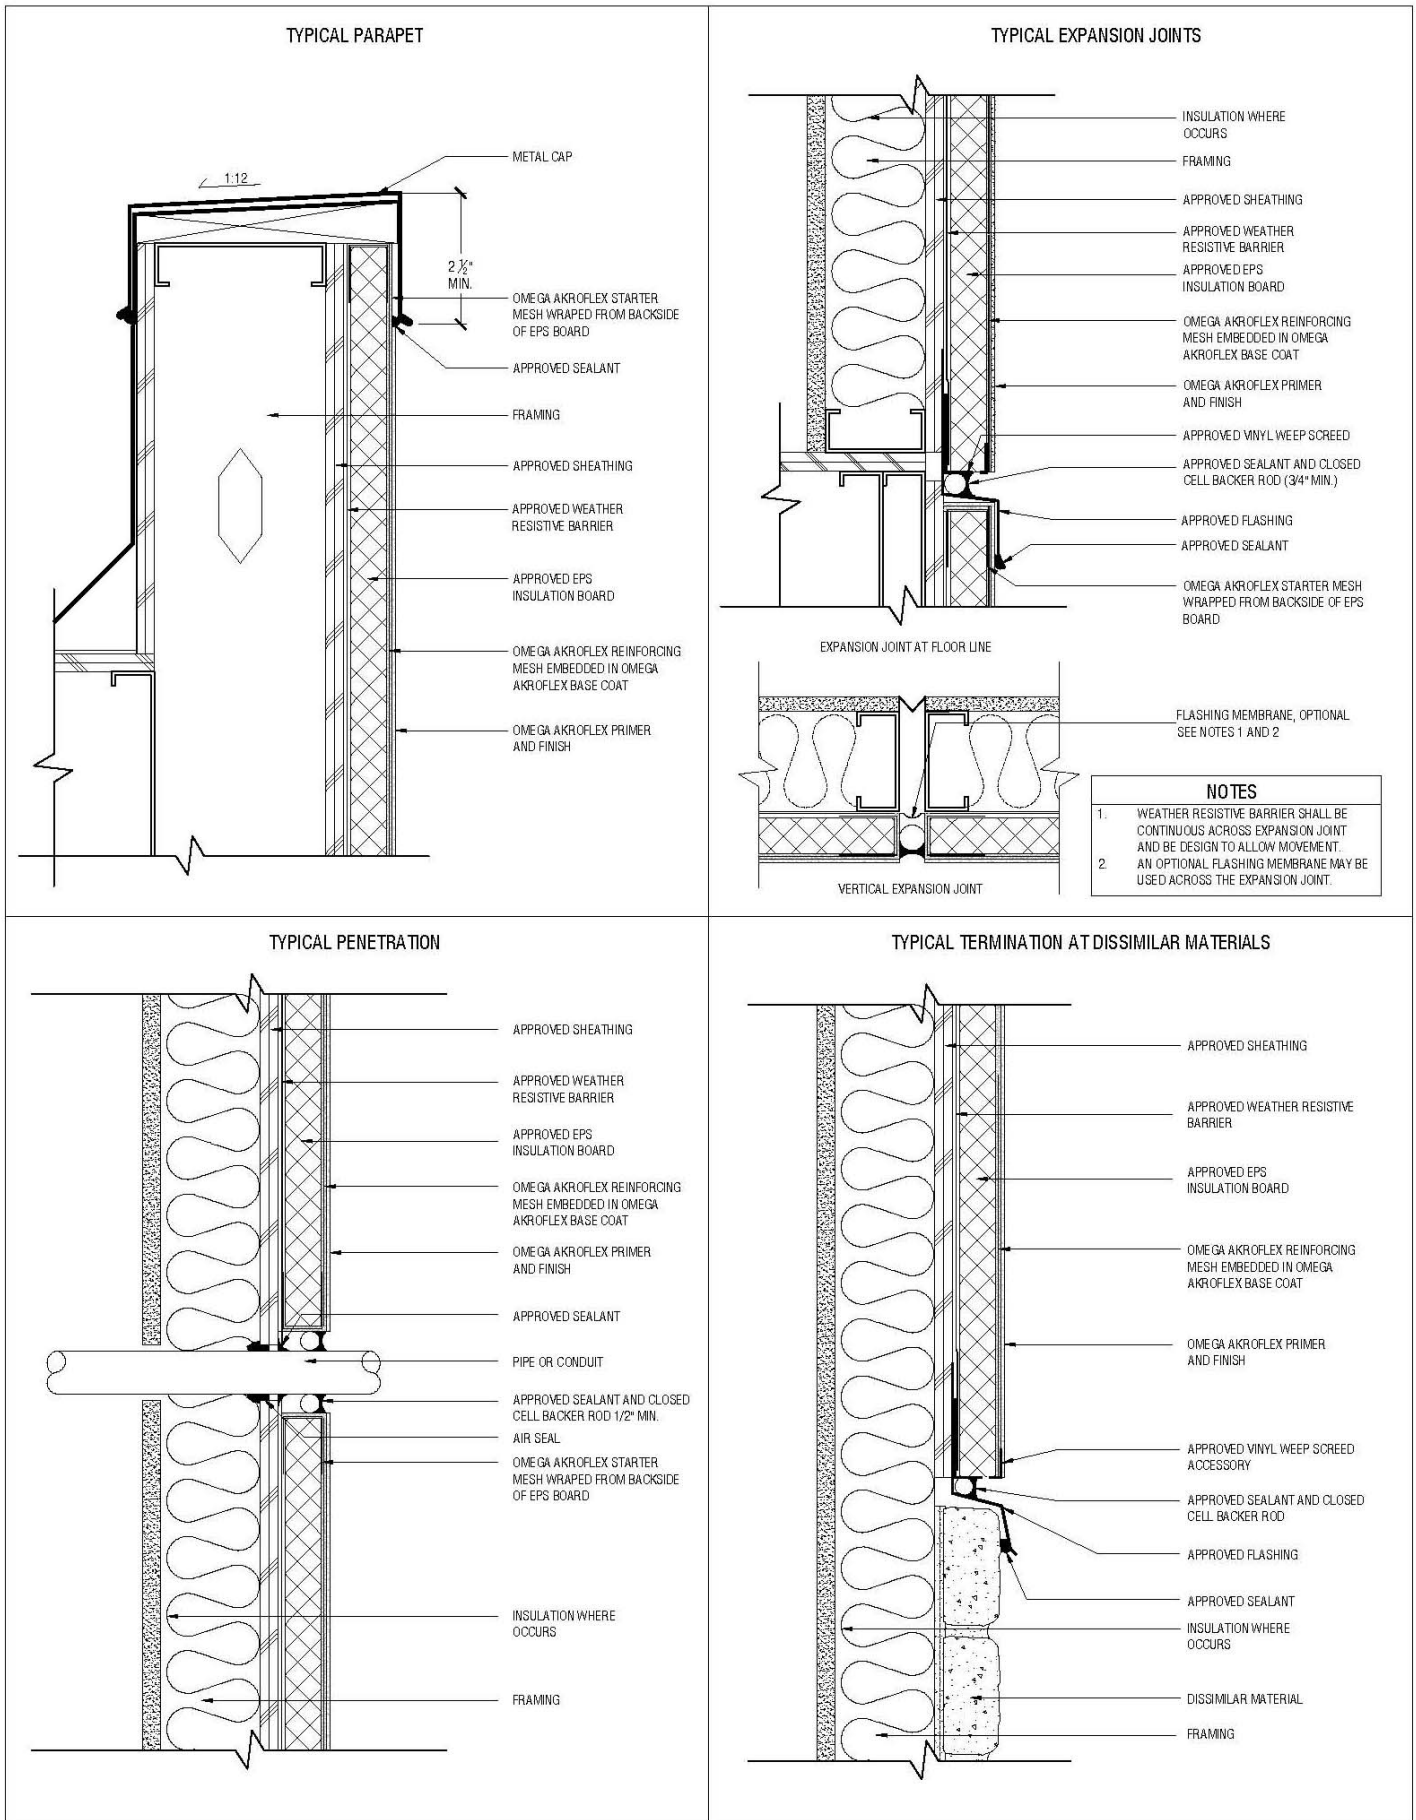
TYPICAL INSTALLATION DETAILS FOR THE AKROFLEX WM SYSTEM (Continued)
